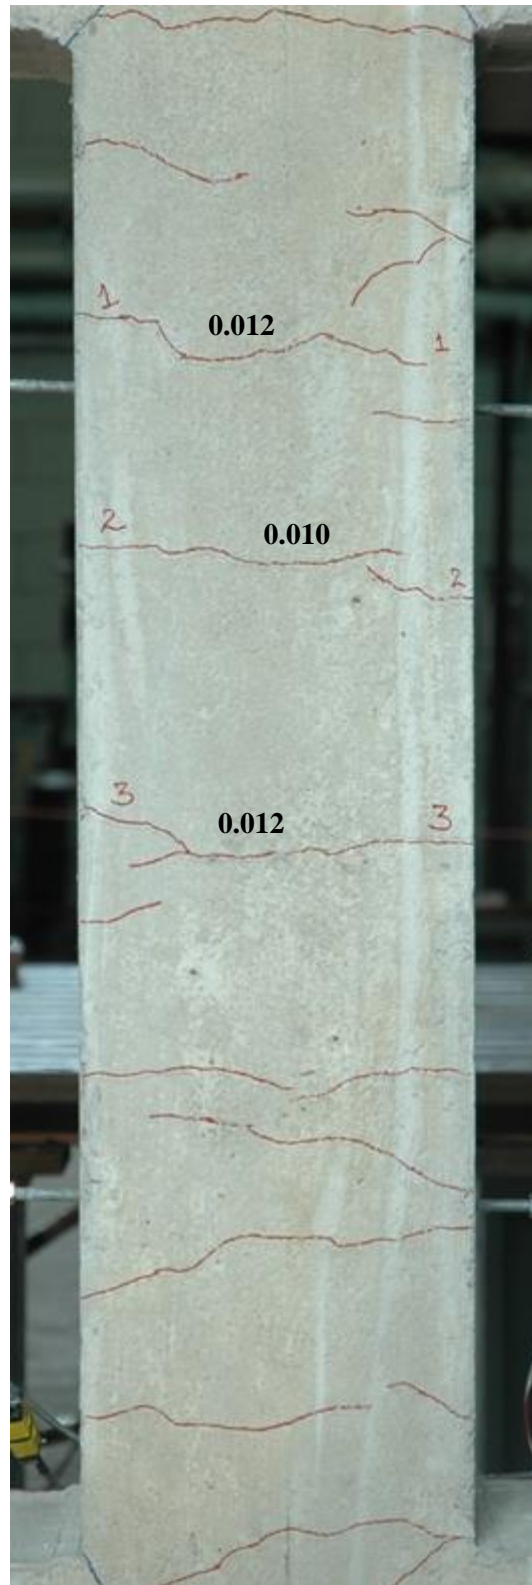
Cracks on west face of TS01 at Load Step 15
